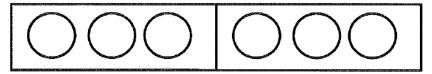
Reinforced Concrete / Pre-stressed Concrete Voided Slab
